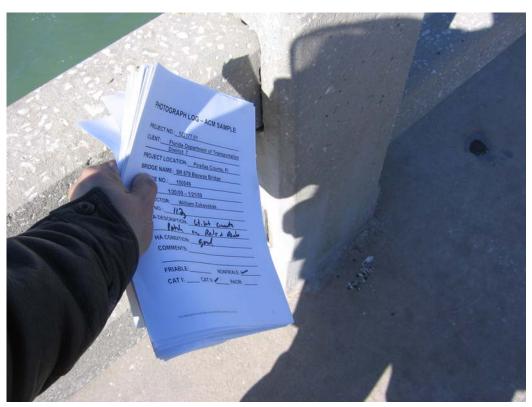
01/21/09 - SAMPLE 11.3 - HA 11 LIGHTWEIGHT CONCRETE PATCHING ON RAILS AND BRIDGE DECK
